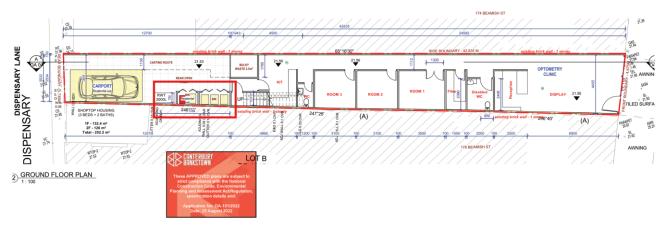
Ground floor - 178 Beamish St, Campsie - Door 1.2m and 1.7m
